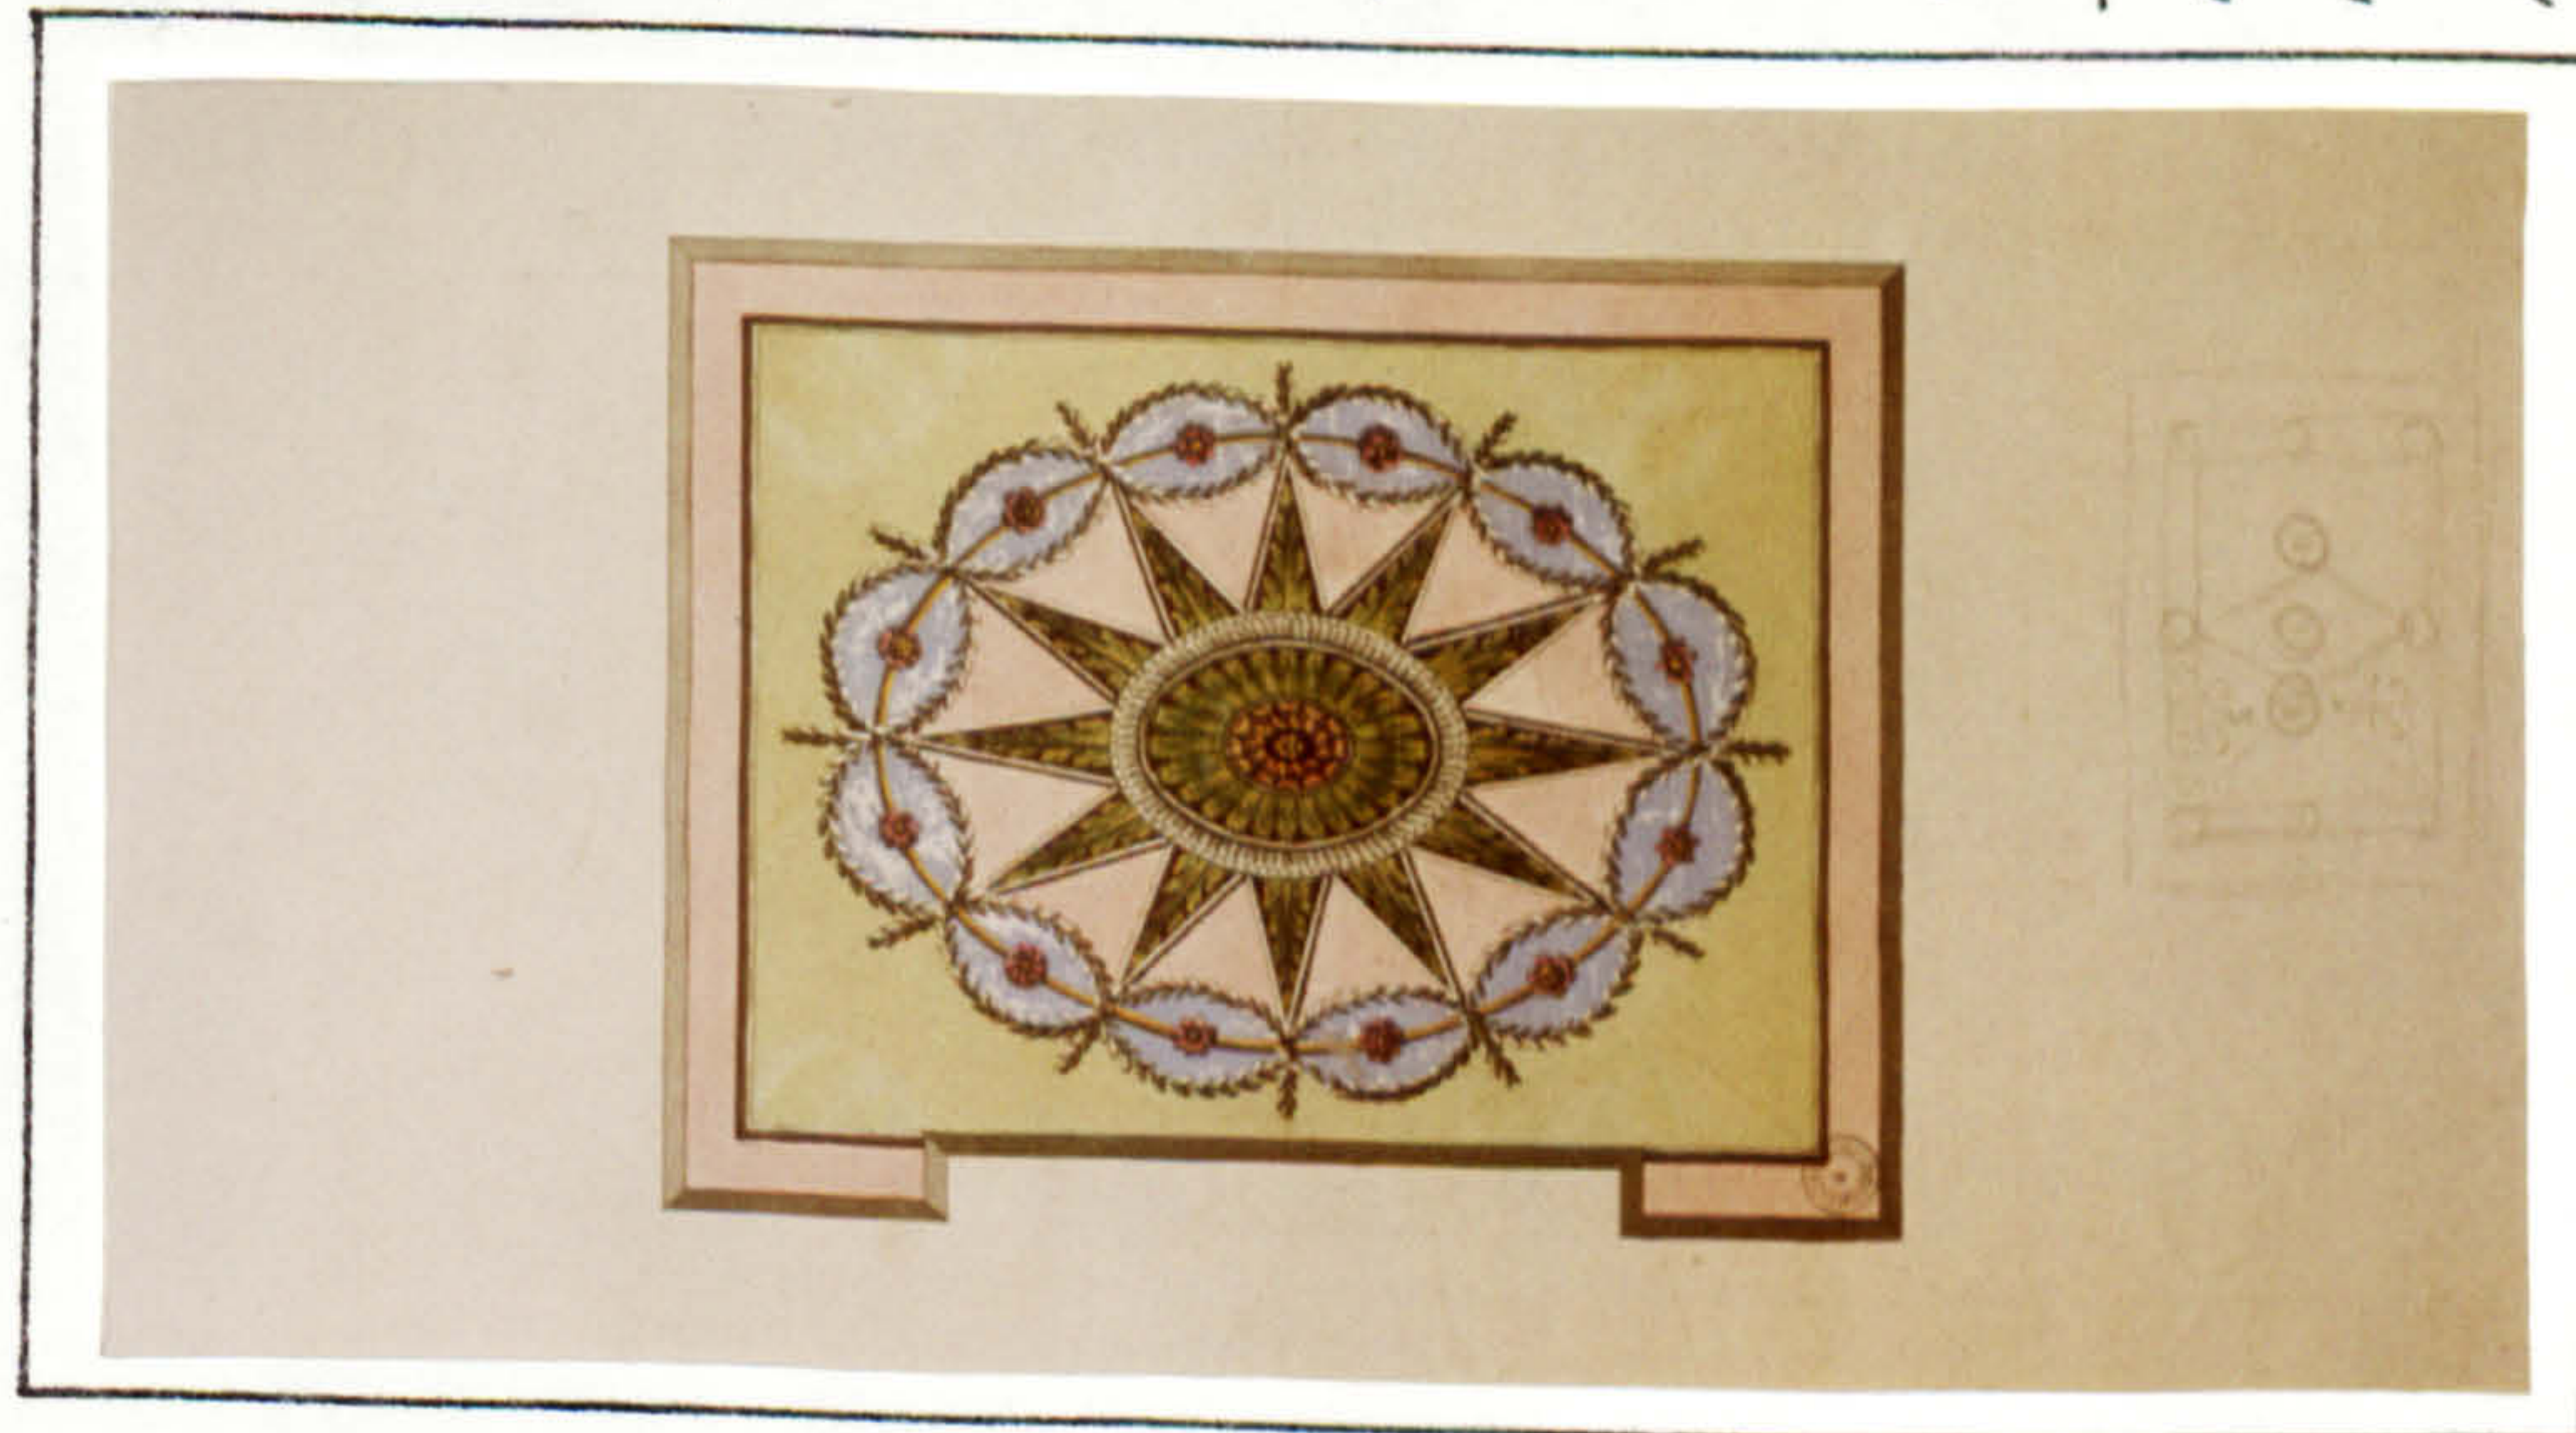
ROBERT ADAM · CEILING FOR COL. BUREOYNES'S ANTE-ROOM · 1769
